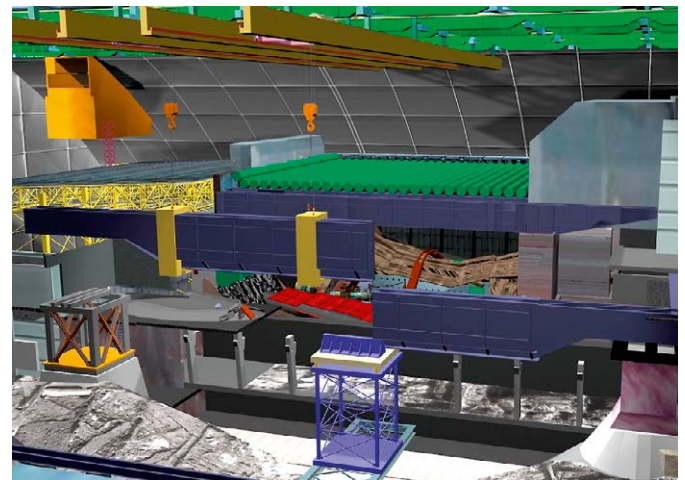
Two NSC cranes equipped with special grips collaborate to fix the cut part of the Mammoth Beam, and transport it for further handling
